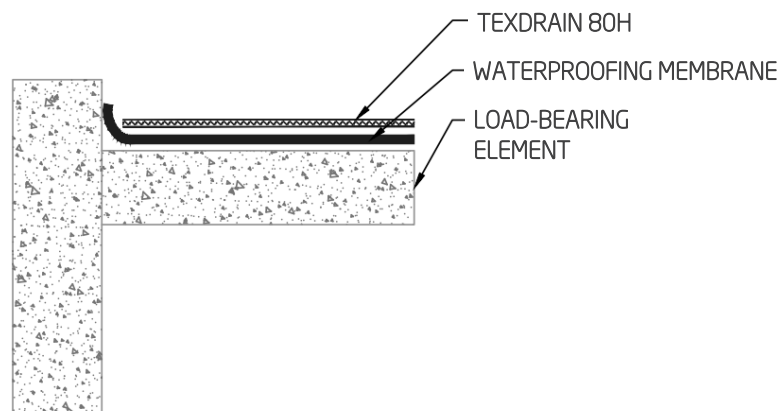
Cross-section of TEXDRAIN 80H installation for roofing
